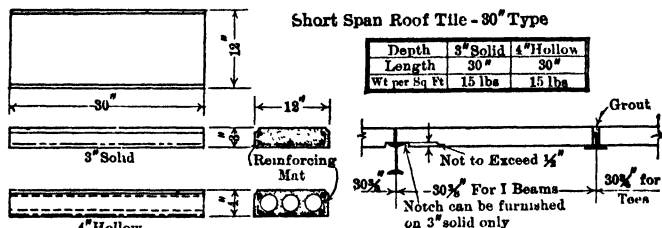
Details of Short Span Pyrobar Roof-Tile. All Tile Reinforced with Electrically Welded Galvanized Steel Mat
